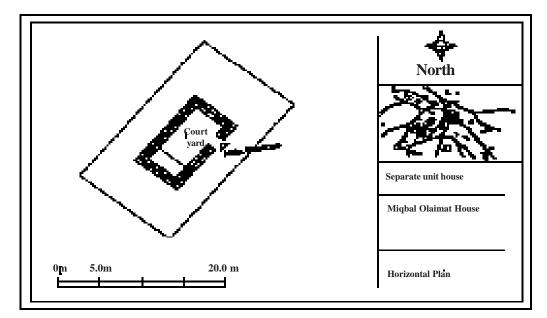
The horizontal plan of Meqbel Olaimat house as a case of the separate house unit (Drawn by authors)
